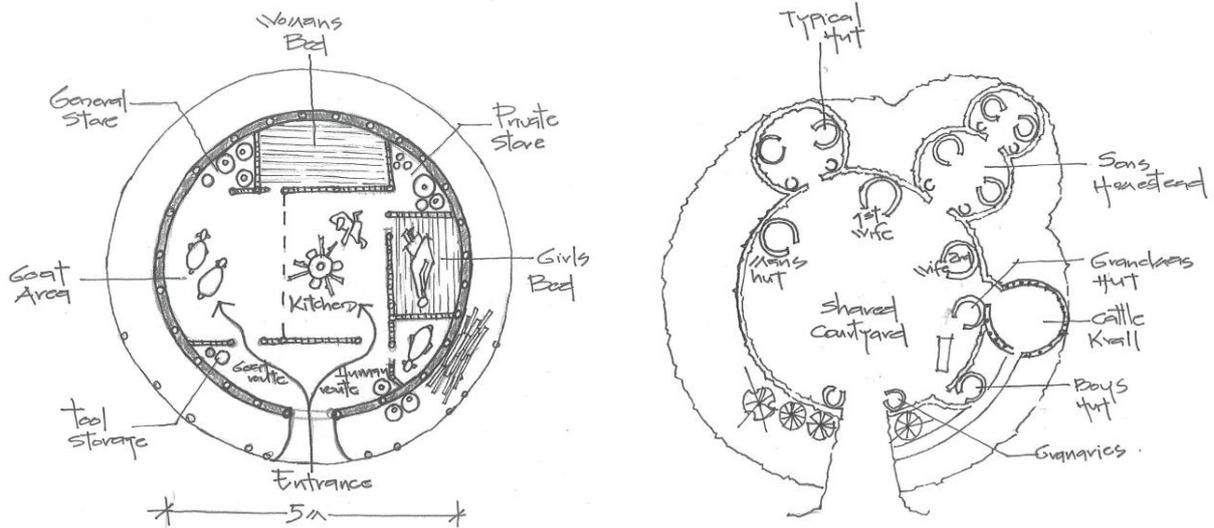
Plan showing typical Kikuyu hut and homestead. Source: Author drawn, 2018
